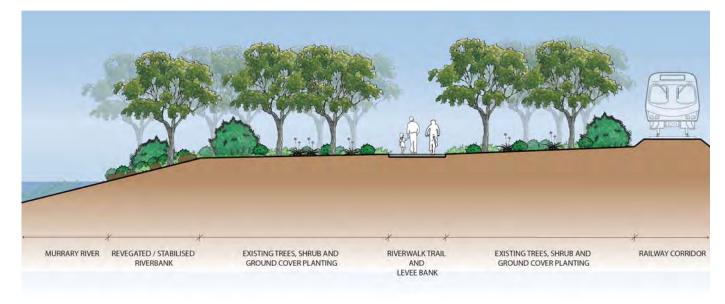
Cross Section - Monash Drive (Adjacent the Caravan Park)
